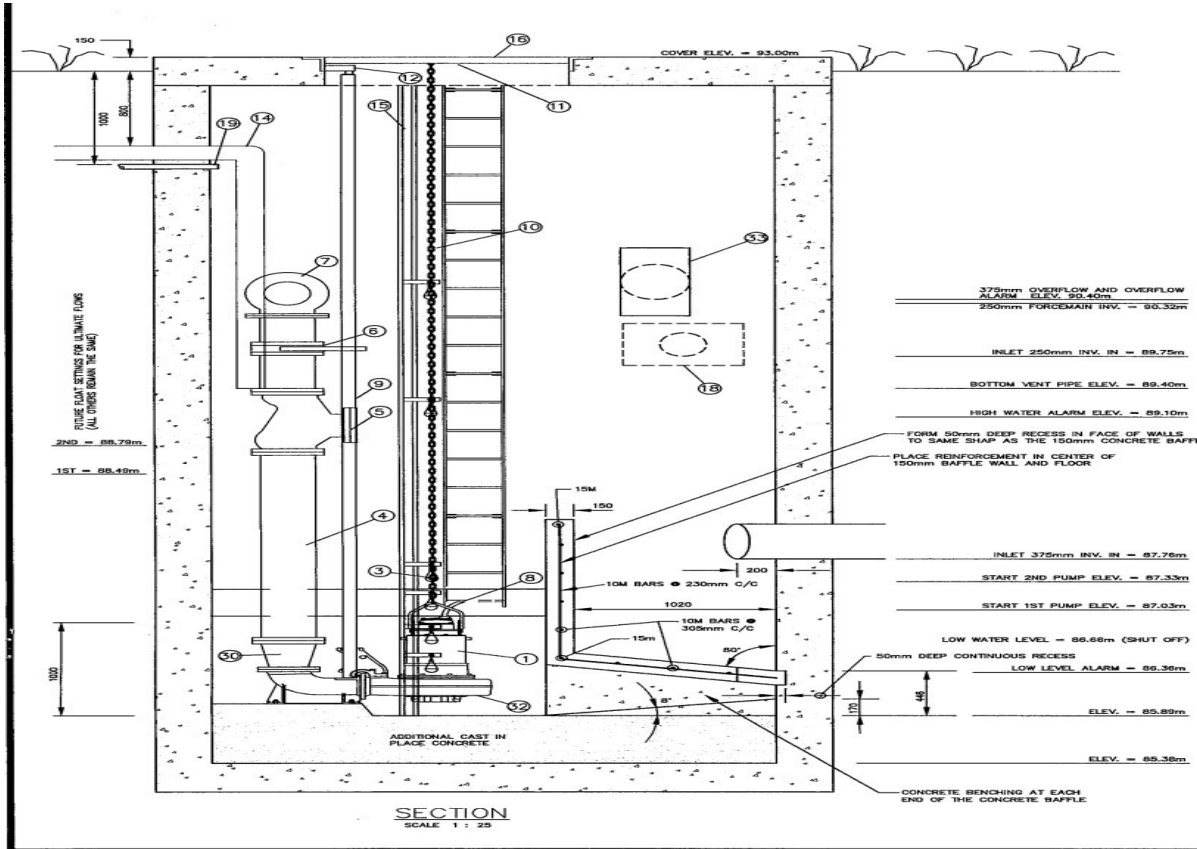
Ragged Lake physical layout – lift-station elevation view.
